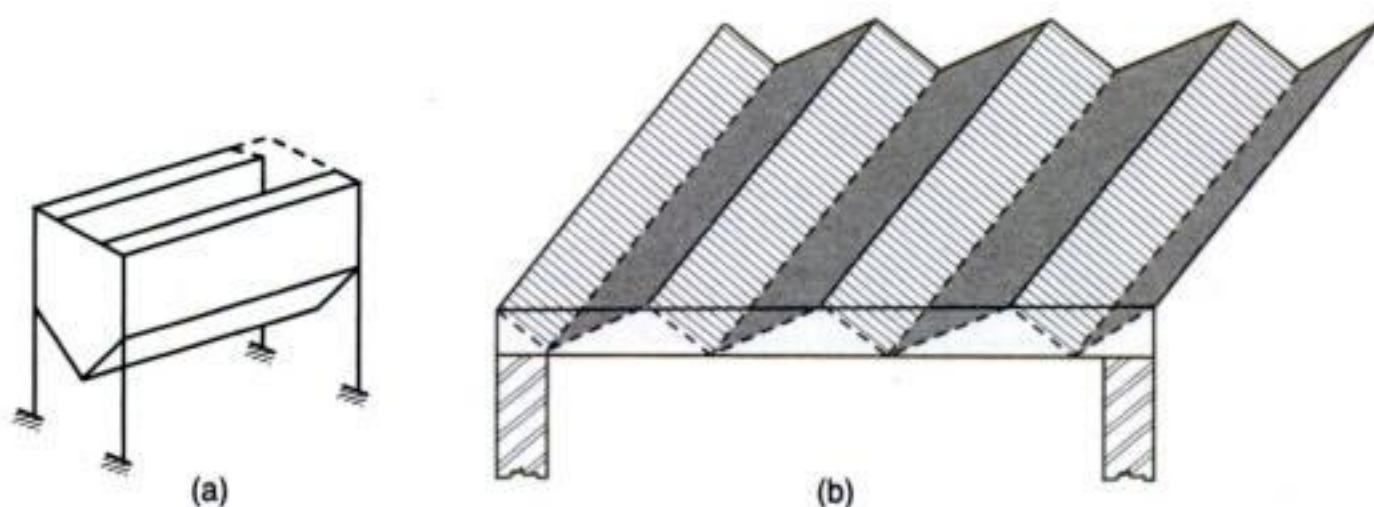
Folded plate construction: (a) Coal bunker, and (b) Folded plate roof with 'v' type folded plates.
